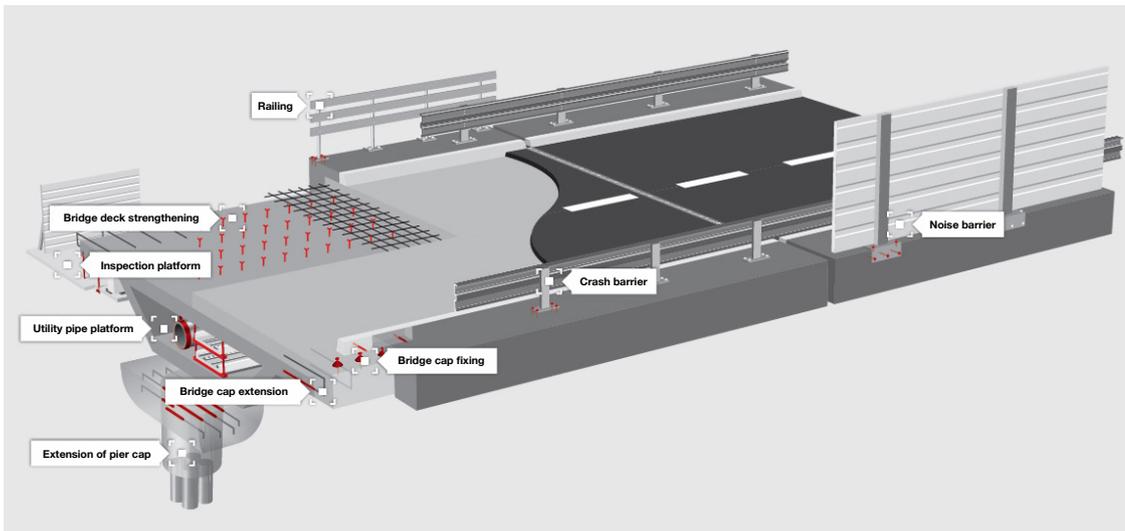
Illustrations of typical applications for jobsite bridges
